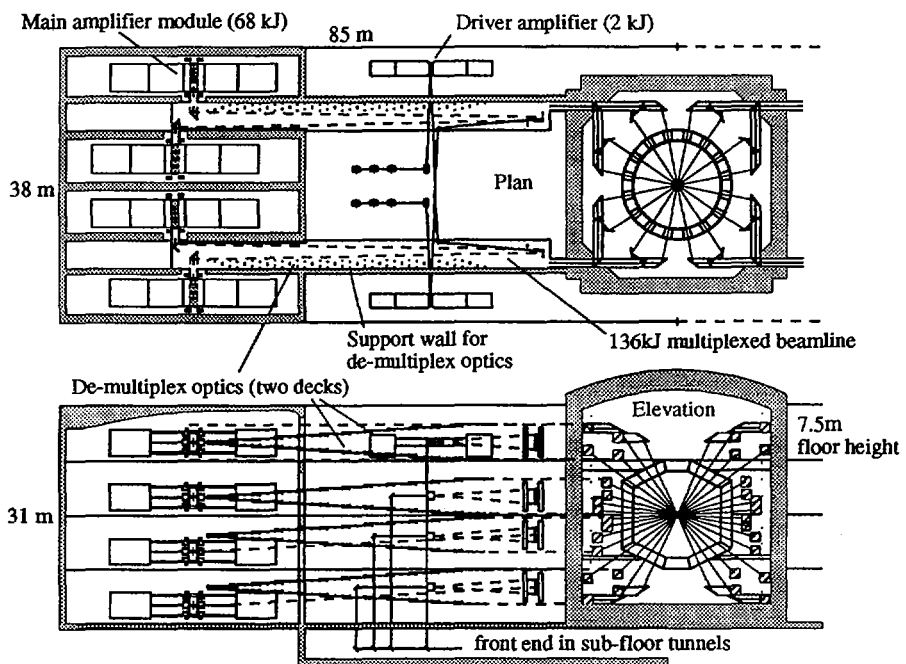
Plan and elevation views of one side of 2 MJ KrF laser facility showing major structural elements.
